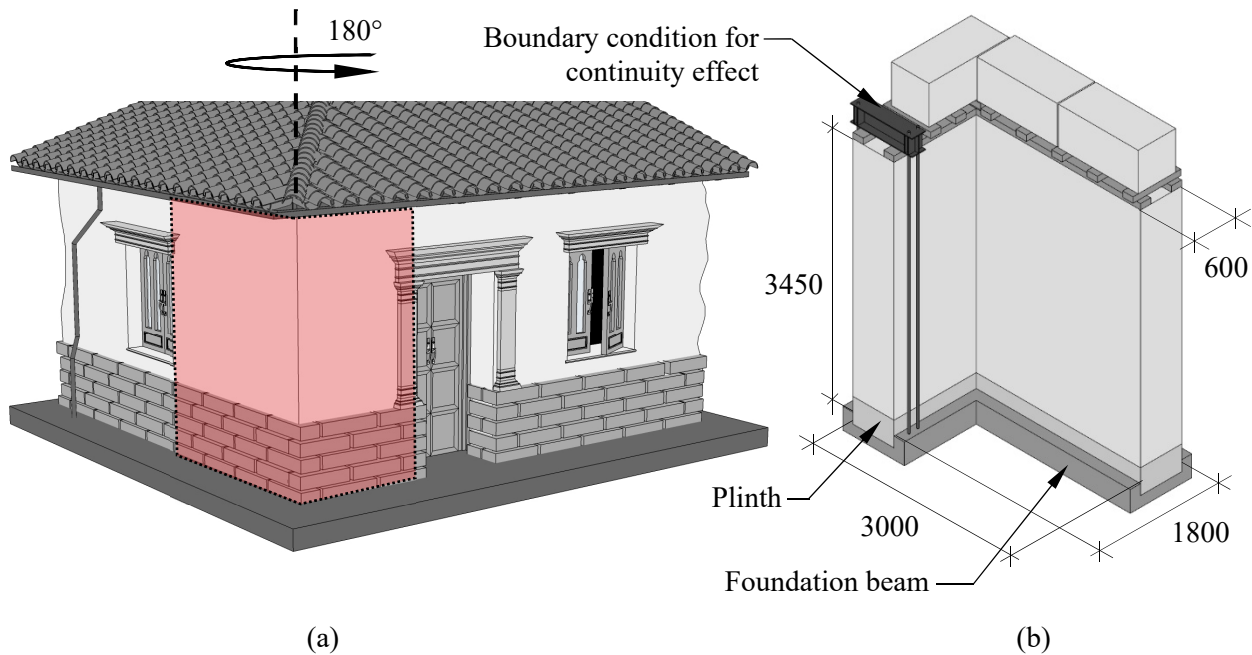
Typical earthen heritage construction and overall geometry of corner earthen wall tested in the laboratory: a) prototype component; b) test specimen.
